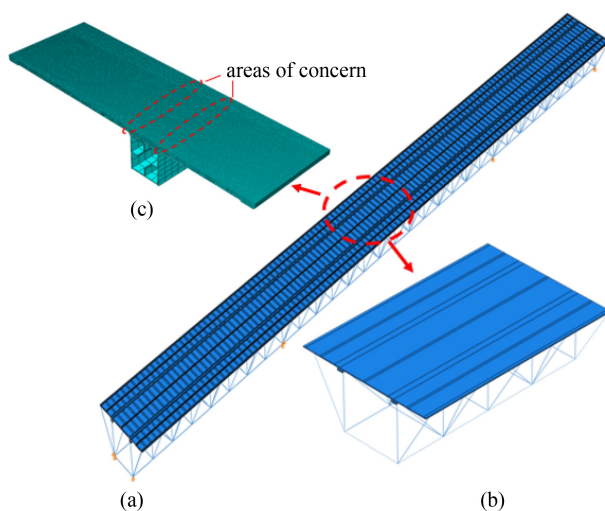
Finite element model of the Nansha Port Bridge: (a) overview of the entire truss bridge, showing highway deck, truss members, and boundary condition; (b) enlarged view of the central portion of the bridge; (c) enlarged view of the bridge deck near the main truss, showing upper chord truss member and areas of concern (hotspots) in the deck.
